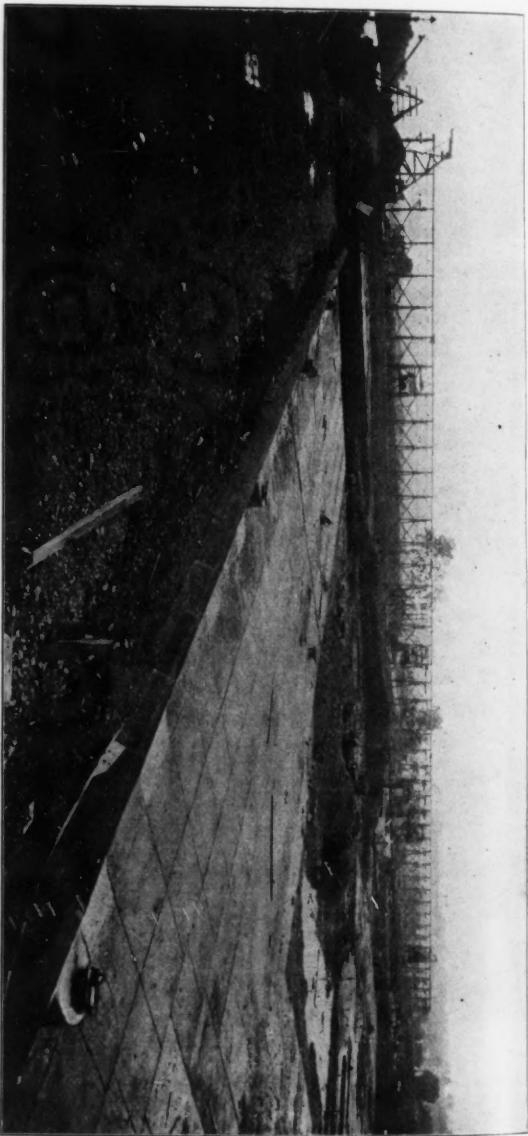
CONCRETE FLOOR OF SEDIMENTATION BASIN, WITH ONE TRESTLE OF HOISTING AND DISTRIBUTING PLANT IN THE BACKGROUND.
